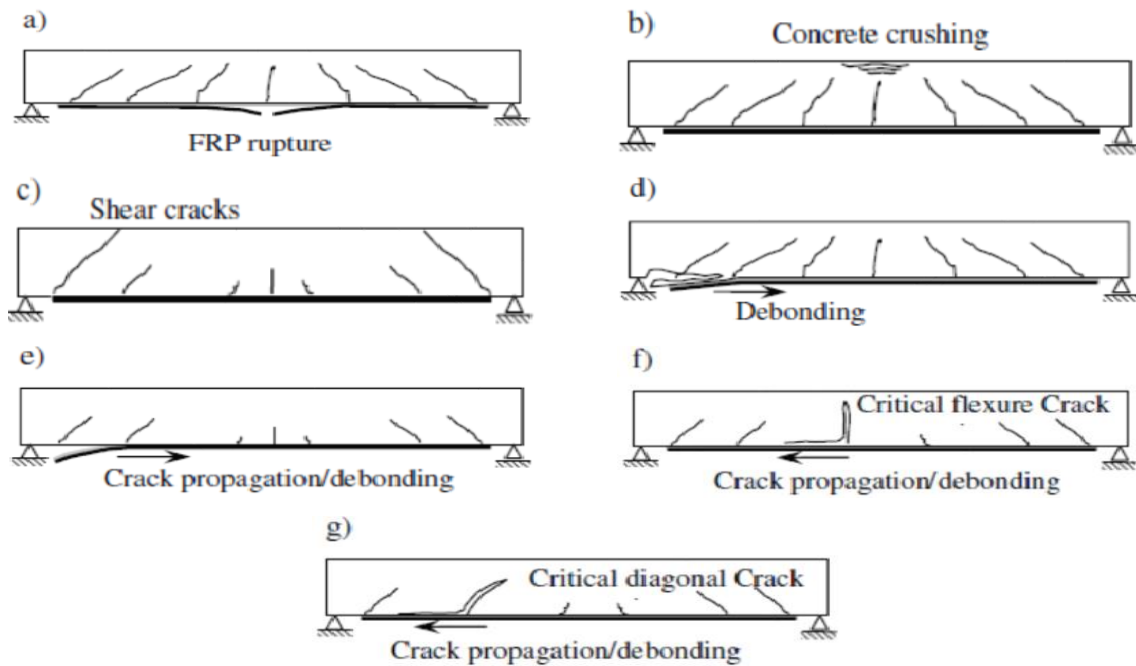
Failure modes of RC beams strengthened with FRP strips [4]
